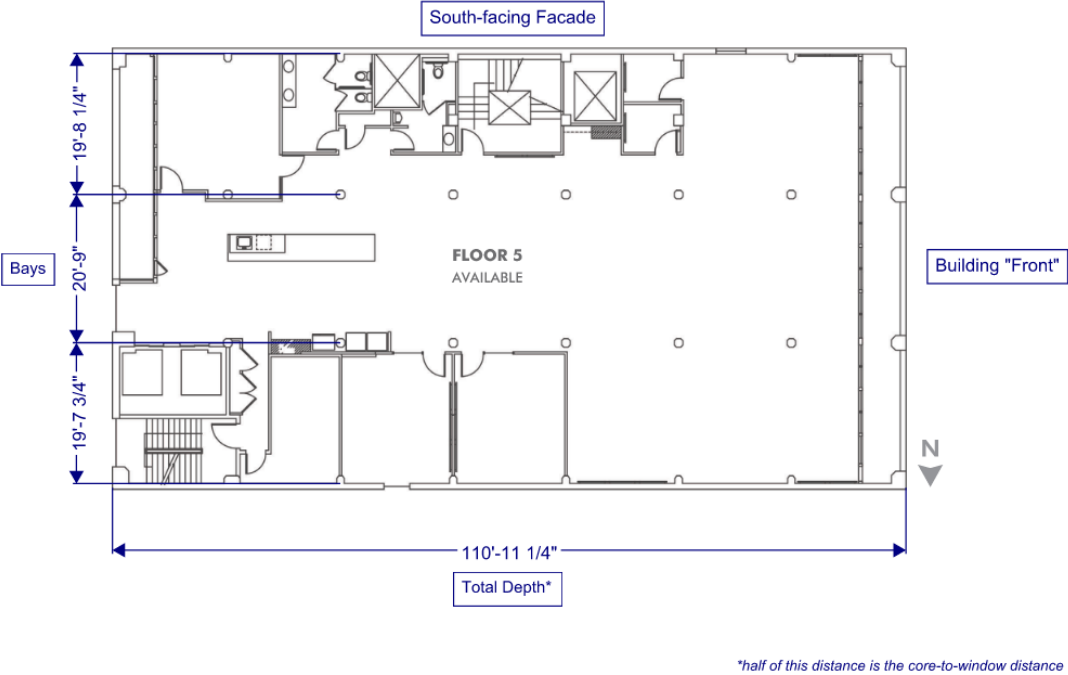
Floor Plan of Gibraltar Tower showing Critical Factors
